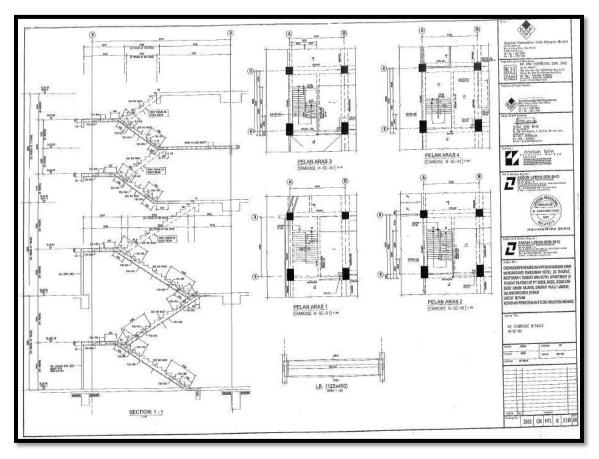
One of type shear wall structural drawing used in this project at Apartment.
